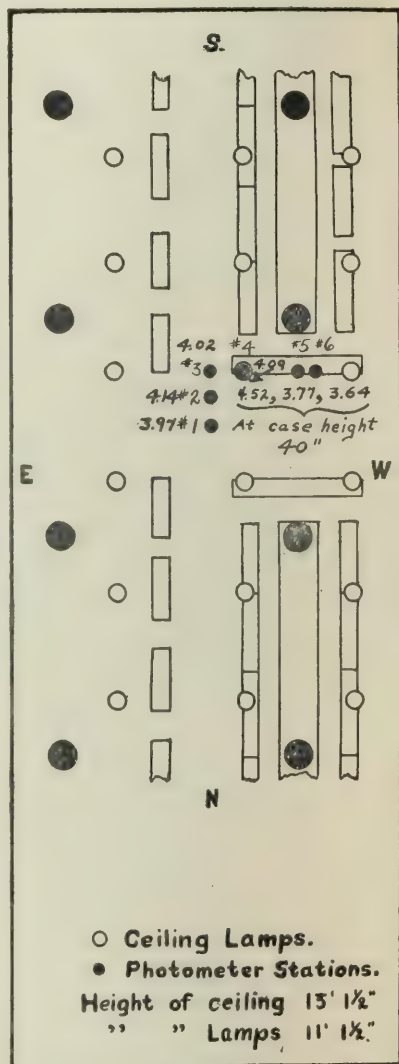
Section plan of fourth floor, (gentlemen's hats), showing location of furniture, pillars, lighting units, test stations and illumination data.
